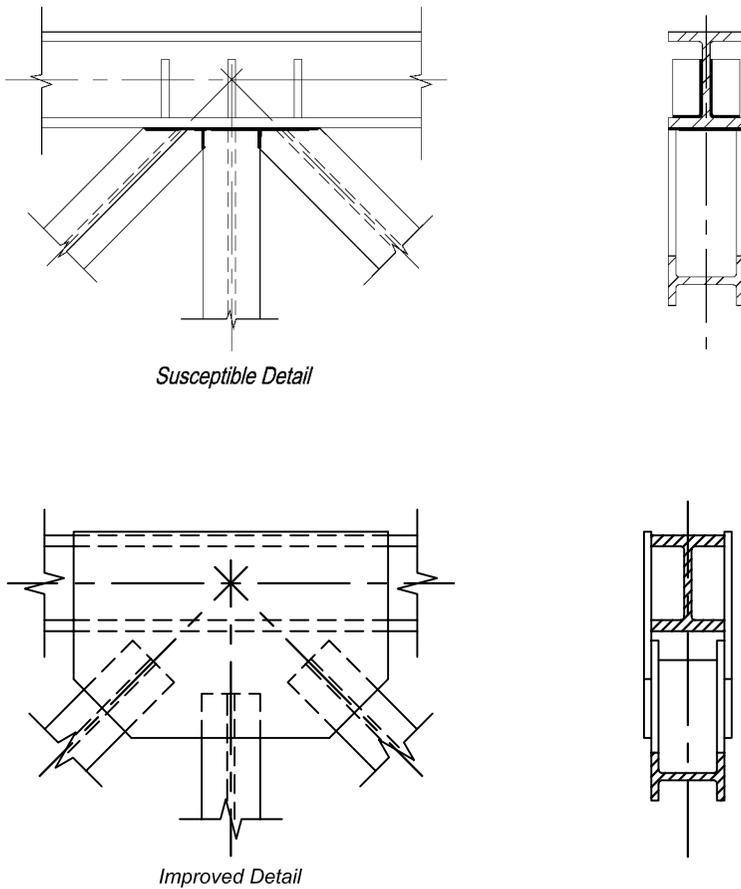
Susceptible and improved details to avoid intersecting welds with high restraint.
